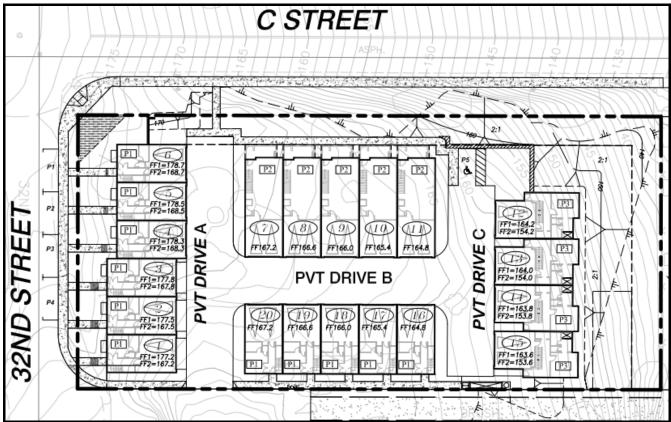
depicts conceptual planning for the layout of the planned development.
